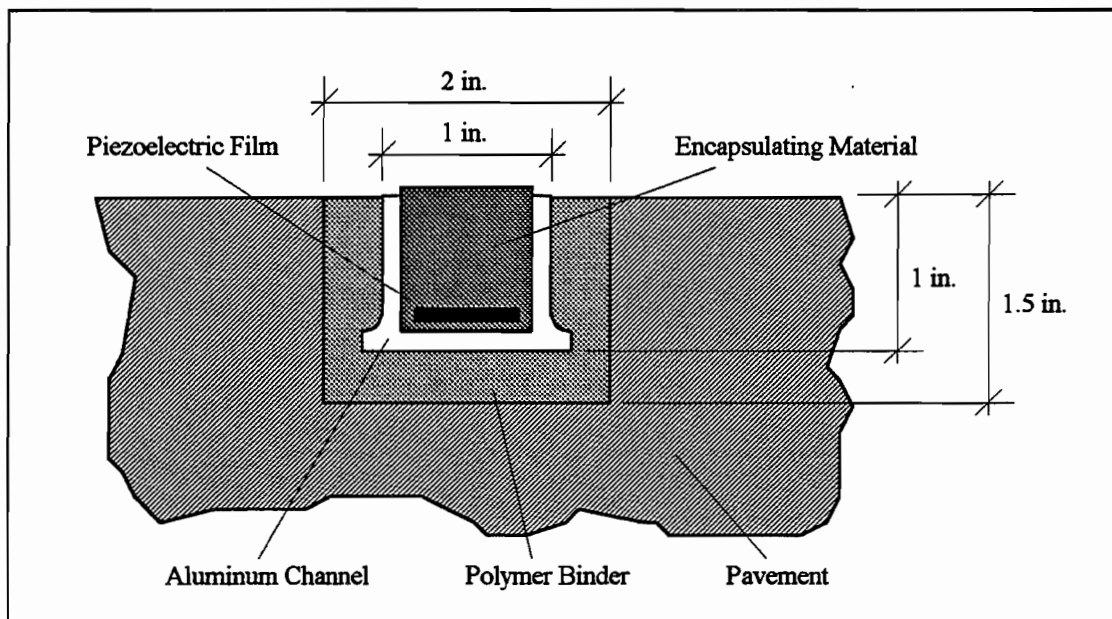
Encapsulated Film Sensor (Installed) (1 in. = 25.4 mm)
